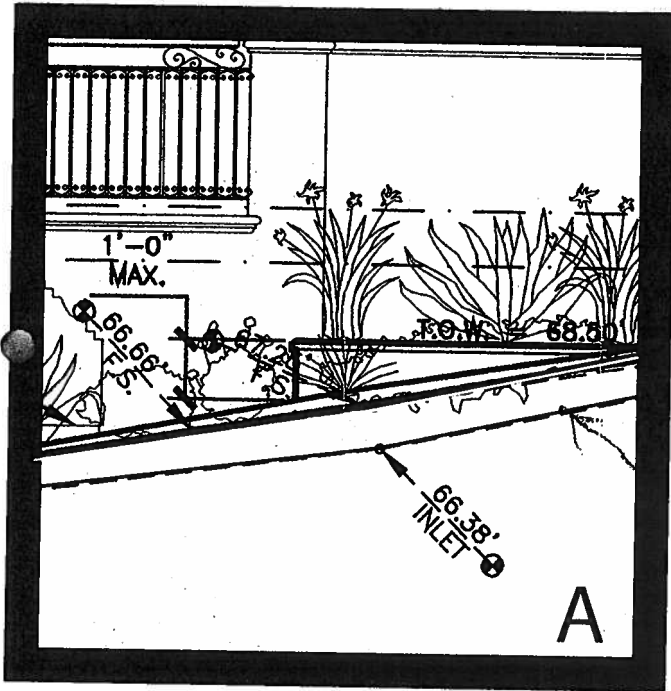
# EXHIBIT G - DECEMBER 15, 2010 APPROVED PLANS
